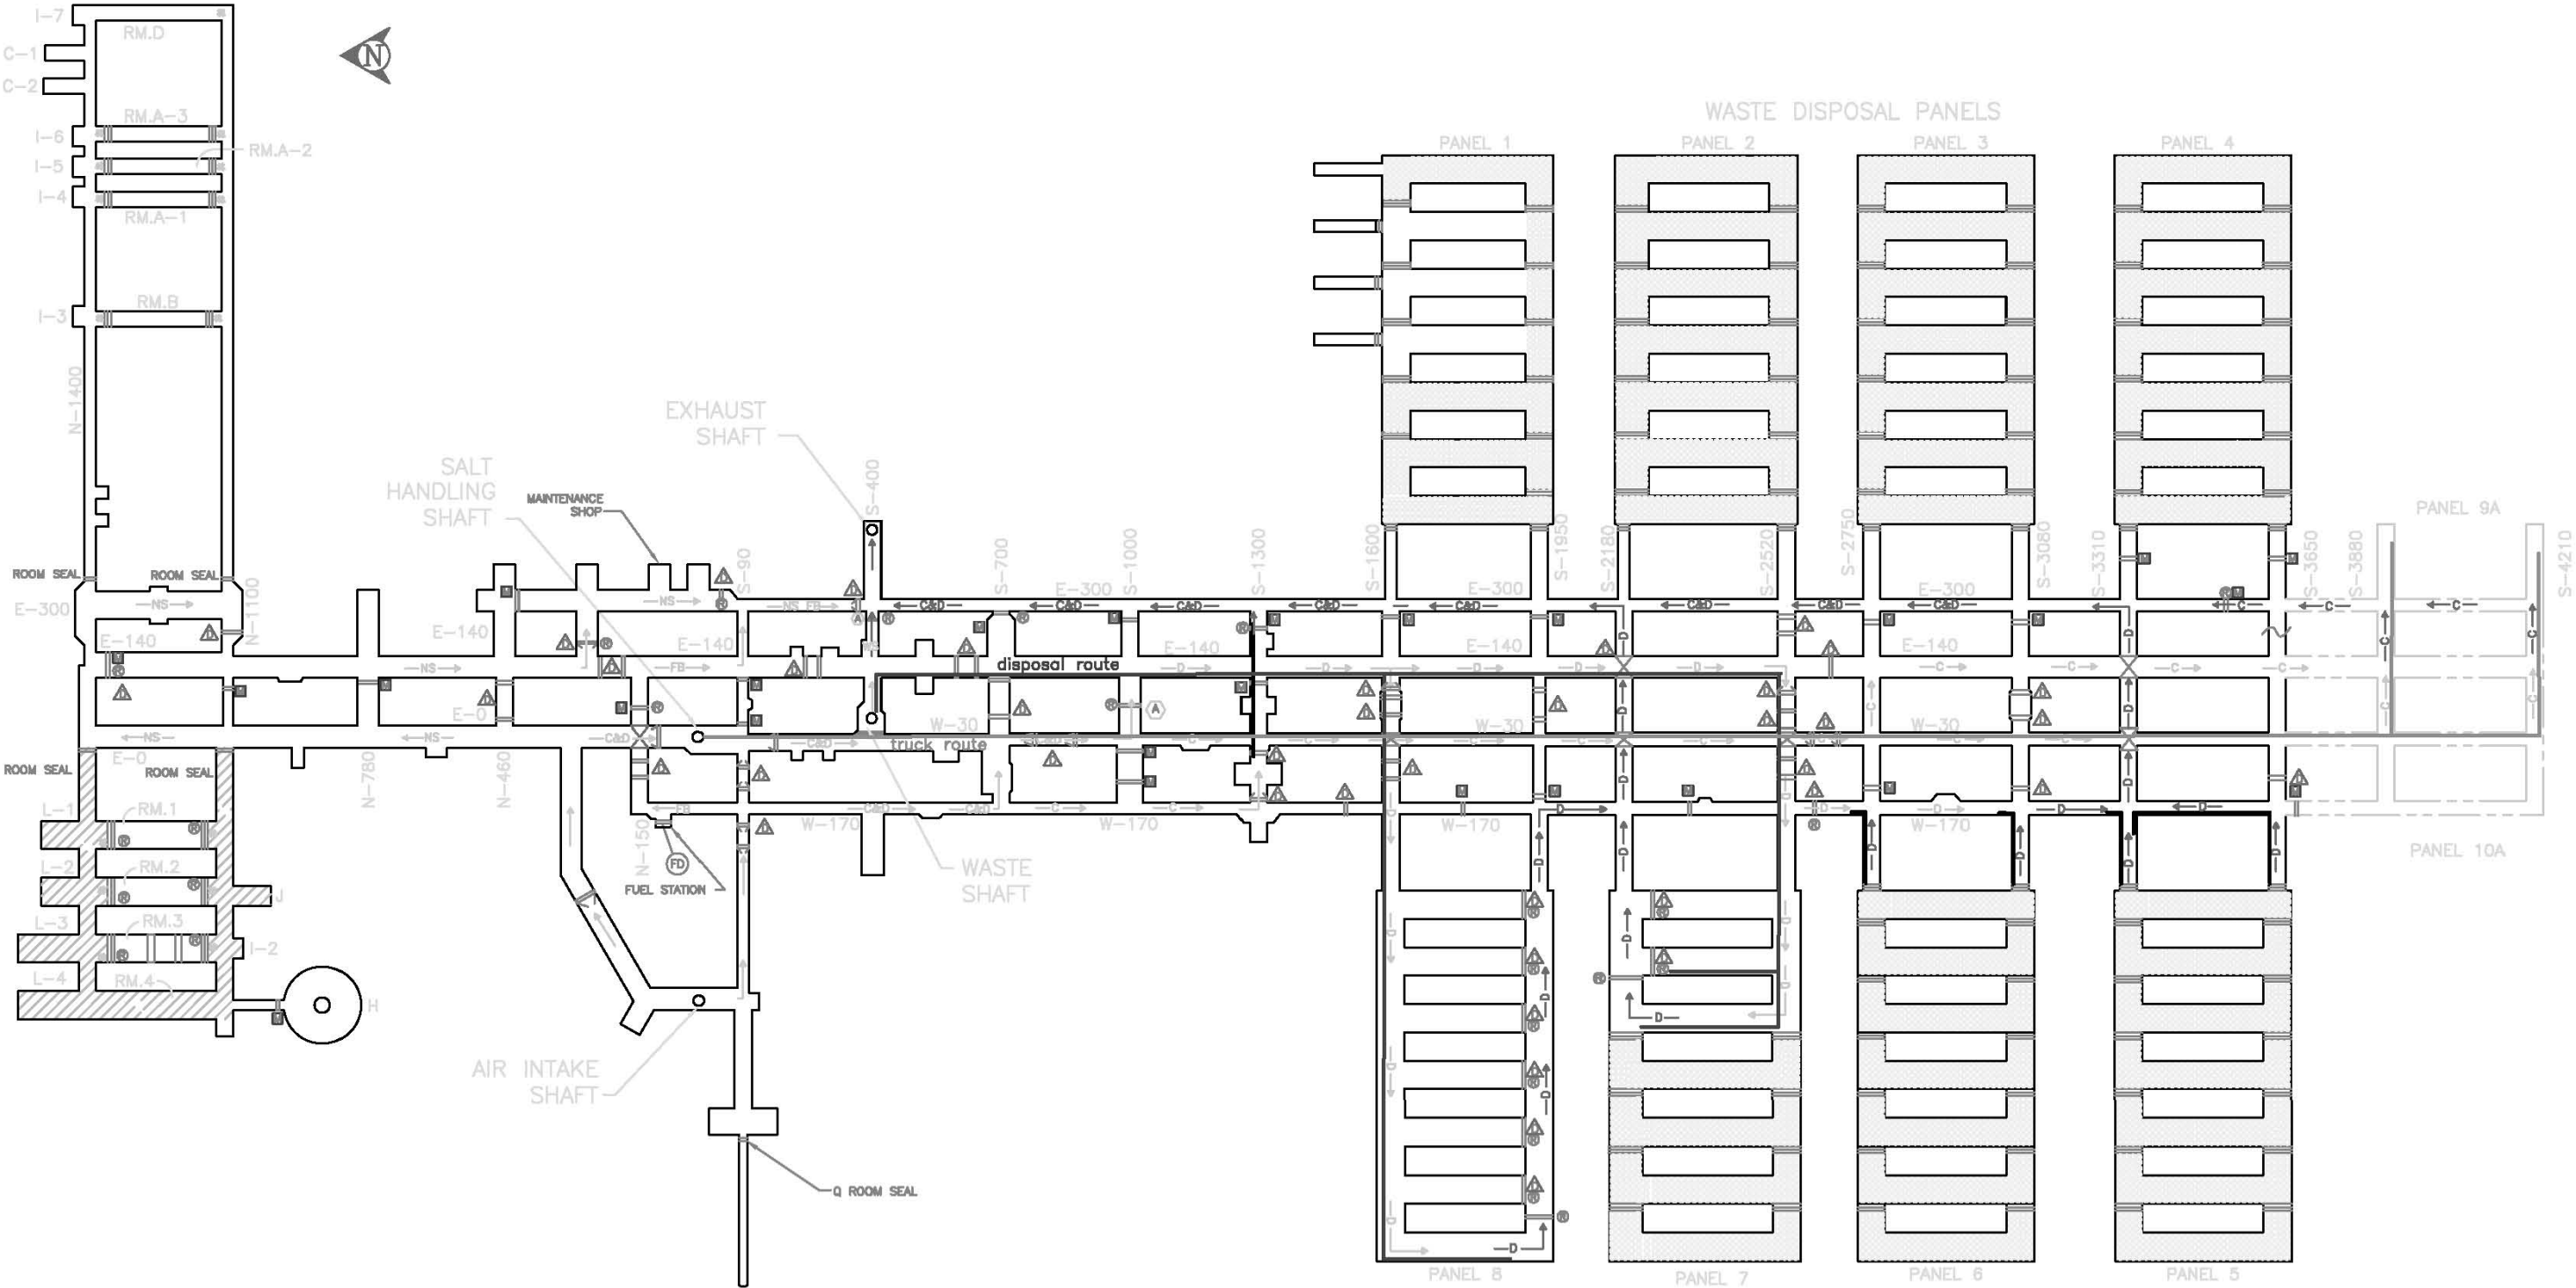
Underground Facility Infrastructure Locations and Primary Disposal and Truck Haulage Routes for the B-1 Ventilation Configuration
